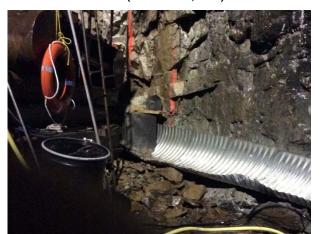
Half-culvert utilized to convey tunnelling wastewater for containment and disposal (November 6, 2014).
